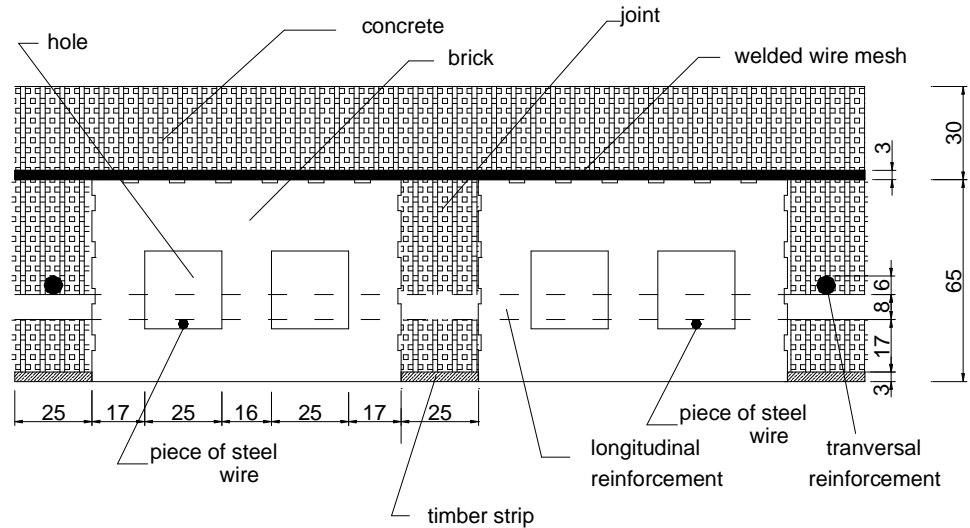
Detail of longitudinal section (A-A in Fig 6) of brick masonry shell, (dimensions in mm).
